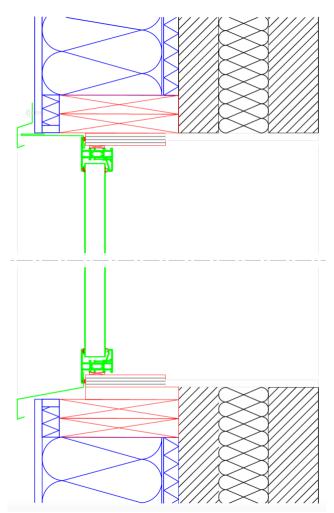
Detail drawing of the window location in the prefabricated TES facade element.
